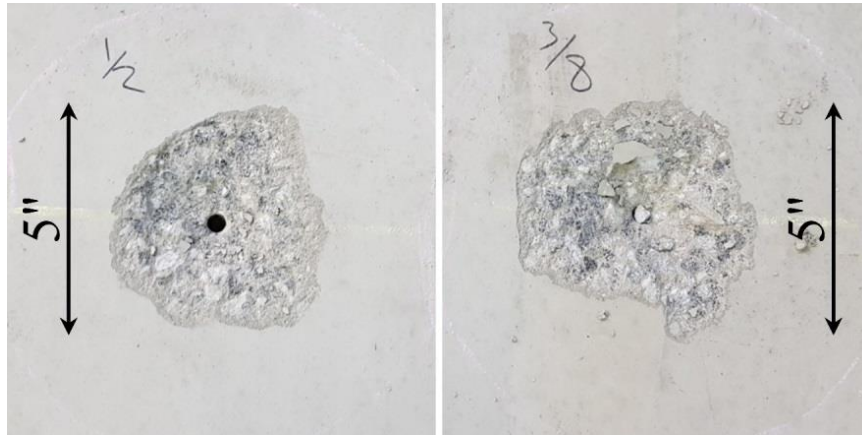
Typical failure mode of screw anchors embedded in 2-in. thick concrete.
